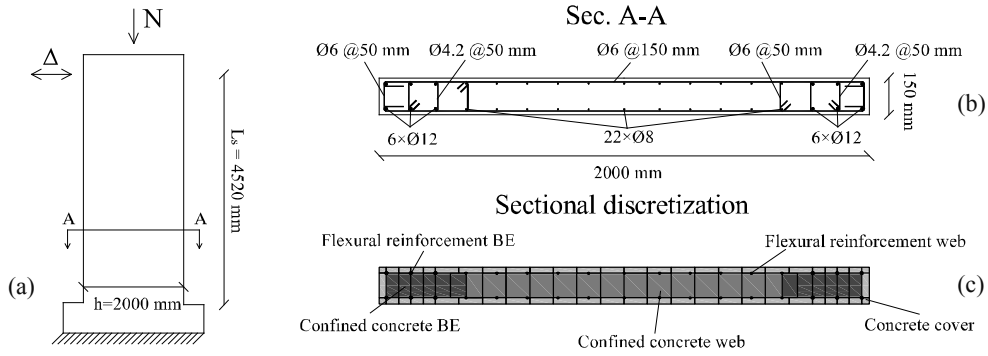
Test unit WSH6: (a) Sketch of geometry and applied loading; (b) reinforcement layout and (c) sectional discretization.
